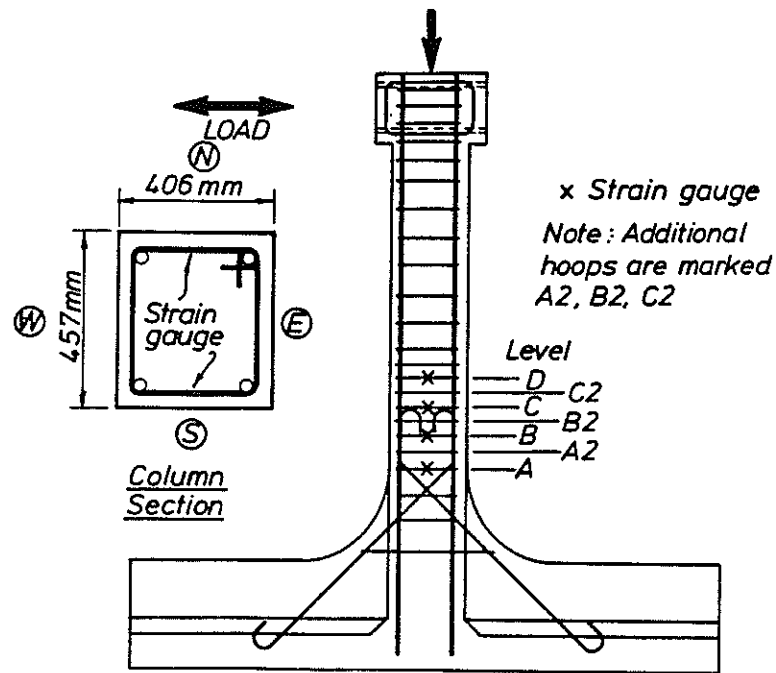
Confinement-retrofit specimen with new hoops added at A2, B2 and C2 (Dekker and Park 1992).
